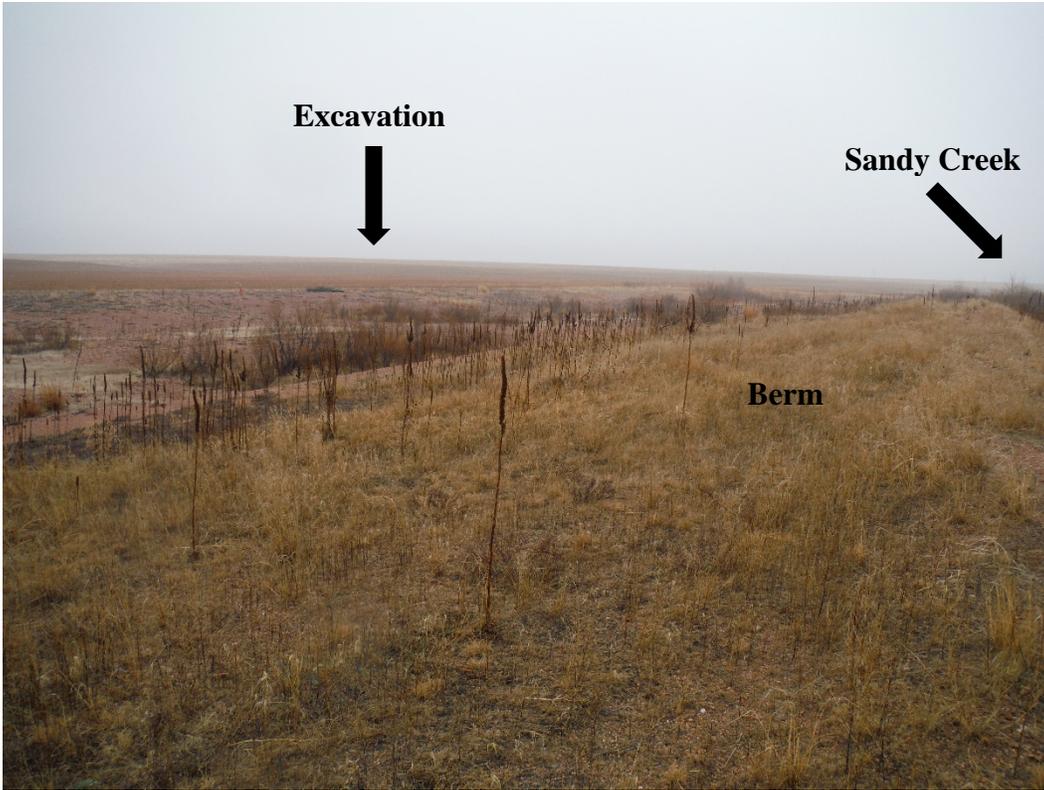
Berm located between excavation (left) and creek channel (right); looking northeast.
